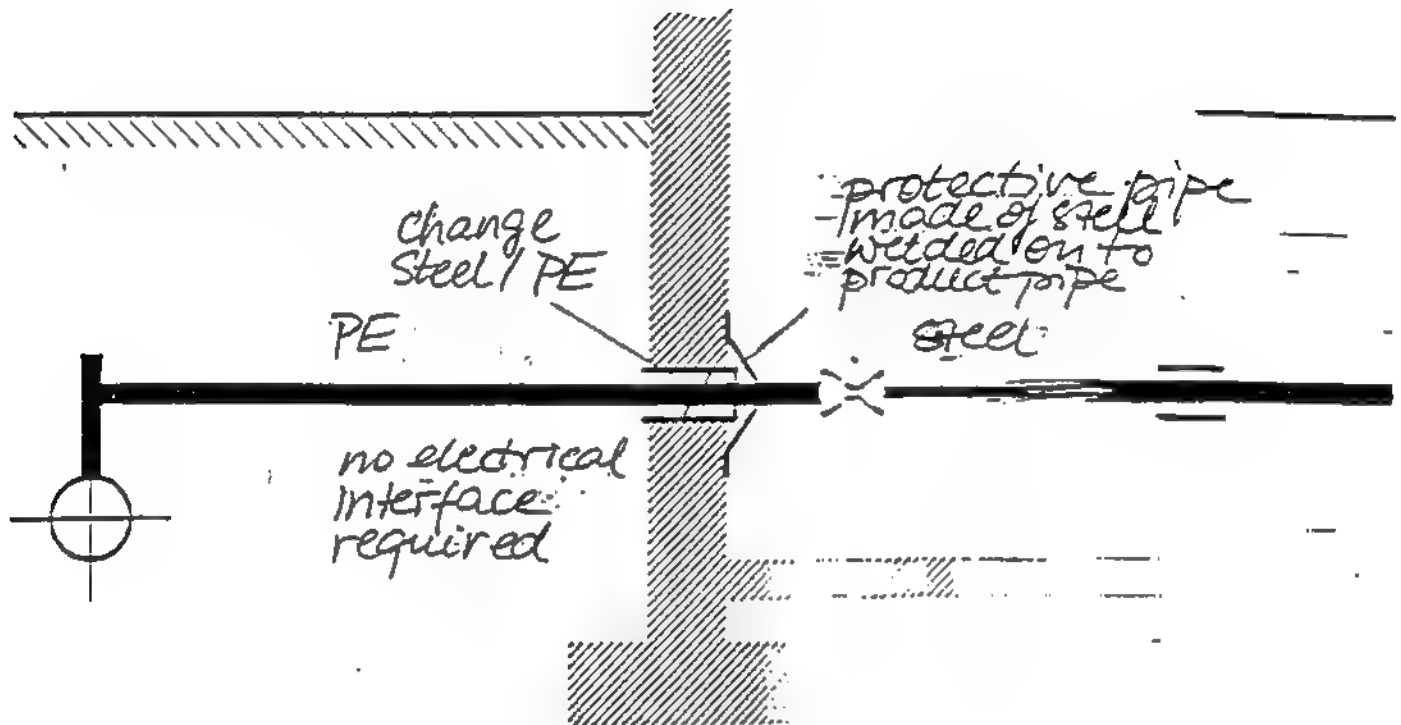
Insulating joint in house-connection line; house-connection line made of PE - transition to steel before wall entrance
